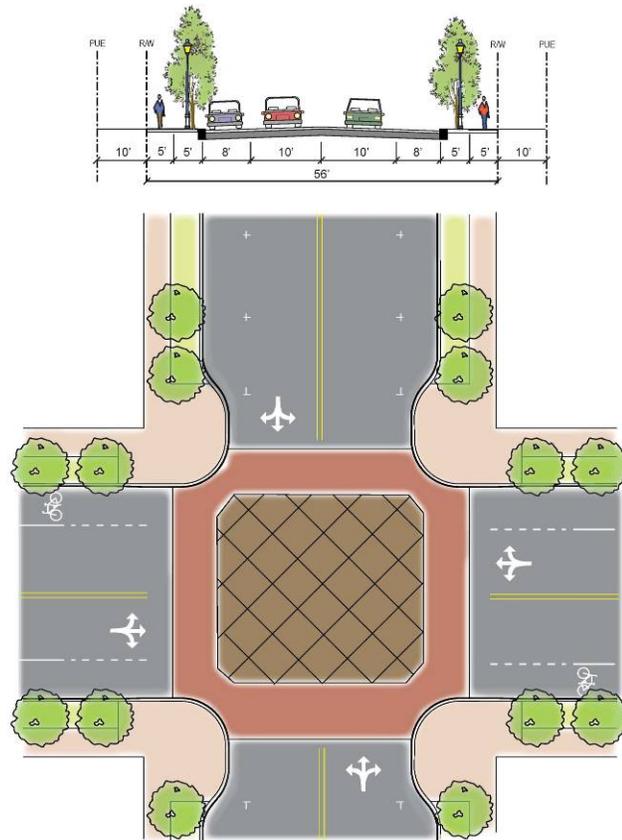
Typical 2-Lane Residential Street With Parking on Both Sides
